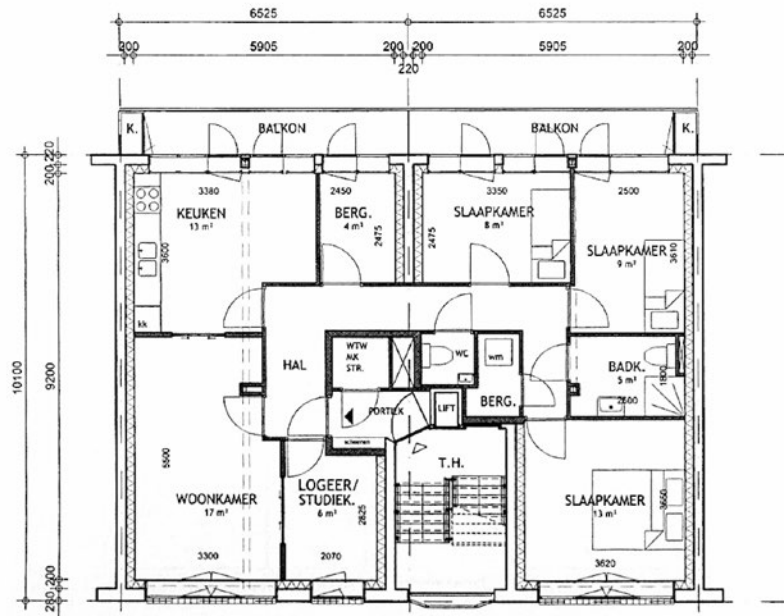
One of the floor plans for the trial walk-up renovation project, showing the proposed internal double-glazed sashes, insulation installation as well as the continuation of use of the grocery lift in the stair well ('Architectenbureau M. Van Haaren, 19 December 2008; Drawing no. 075 'plattegrond nieuw'; (Archivolt Architects, (0757), Amsterdam)).
